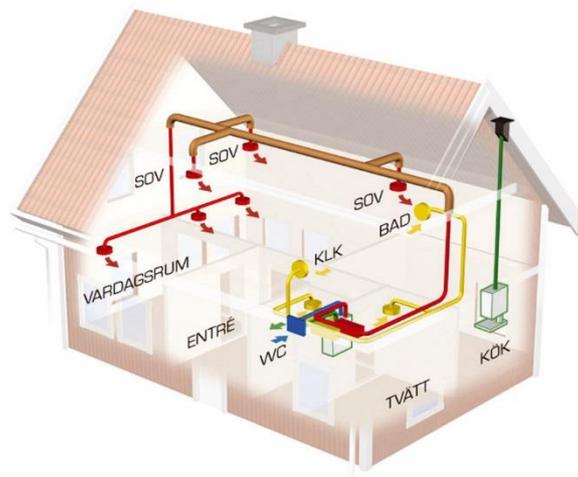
Common HVAC system layout in residential buildings. Picture used with permission from Fläkt Woods
